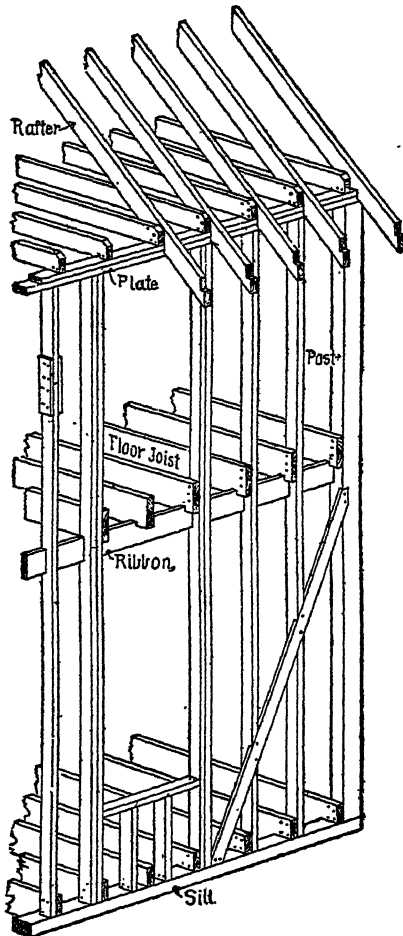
BALLOON SIDE AND FLOOR FRAMING.
